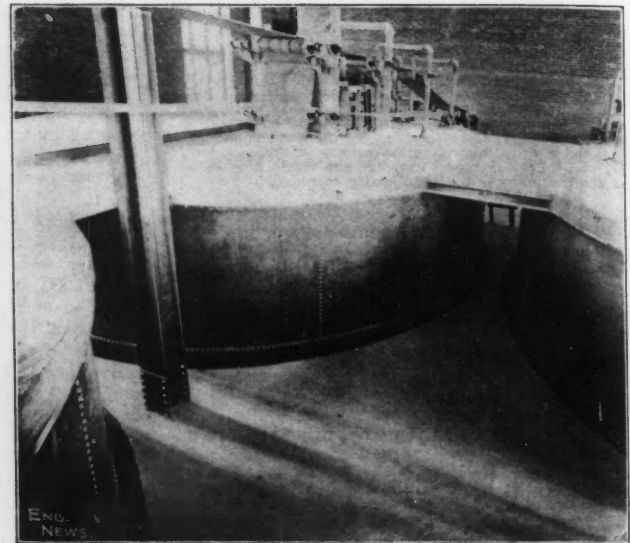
INTERIOR VIEW OF THE NEW YORK SUGAR REFINING CO.'S NEW REFINERY, SHOWING MANNER IN WHICH CONCRETE FLOORS WERE CUT FOR LARGE TANKS.
